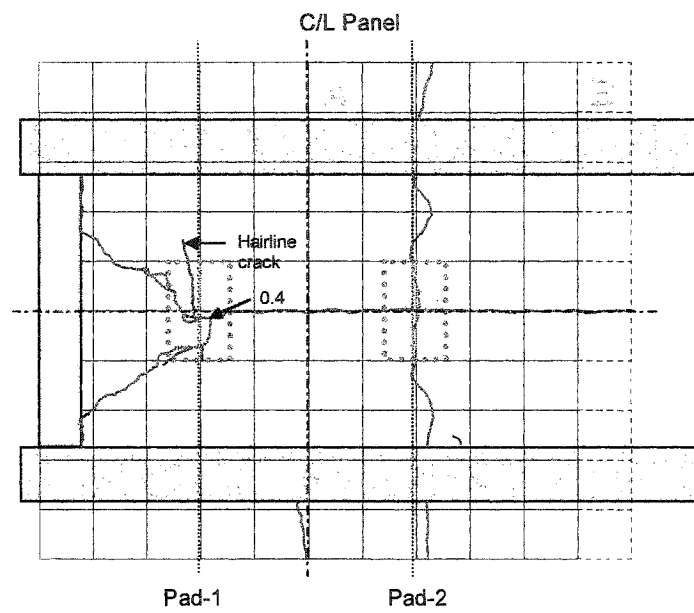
Panel-A: Crack Patterns on Soffit after 100 Load Cycles
